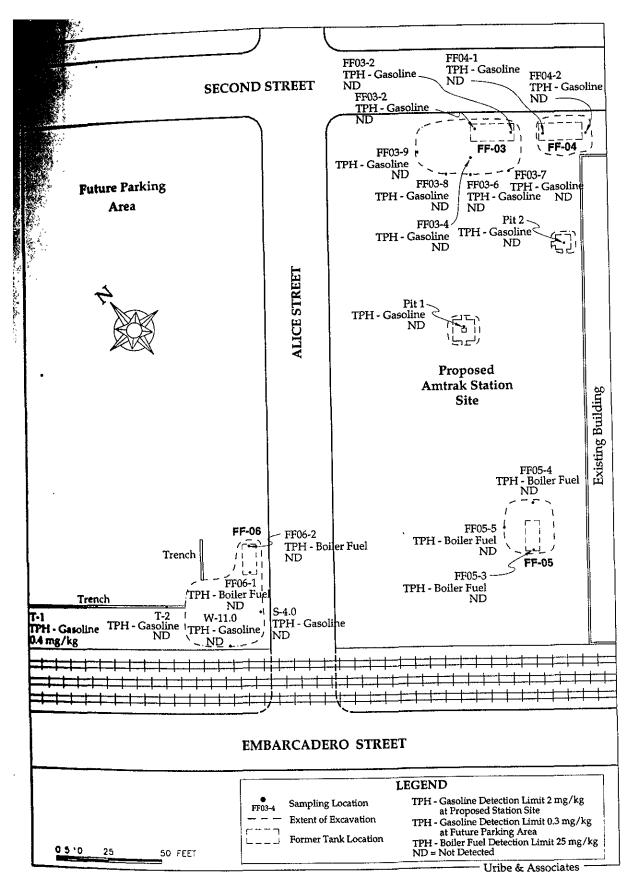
Site Plan, with Sample Locations and Results for Full Extent of Excavations
